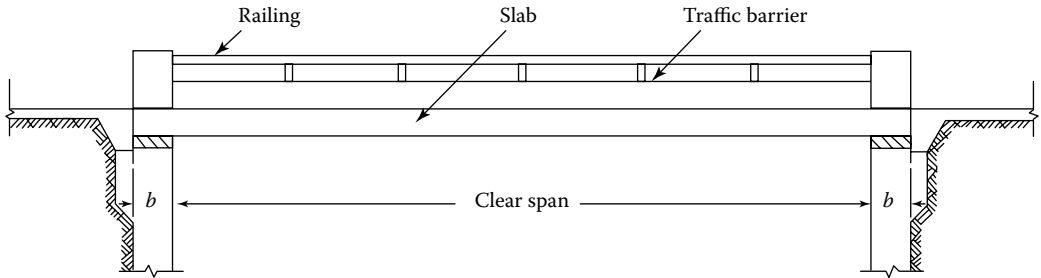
Typical reinforced concrete slab bridge. The slab is supported between the abutments; the longitudinal reinforcement is oriented *parallel* to the direction of traffic.
